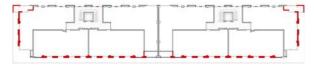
Cerdanyola residential building, typical floor. In red, solar wall in south/east/west facades.
